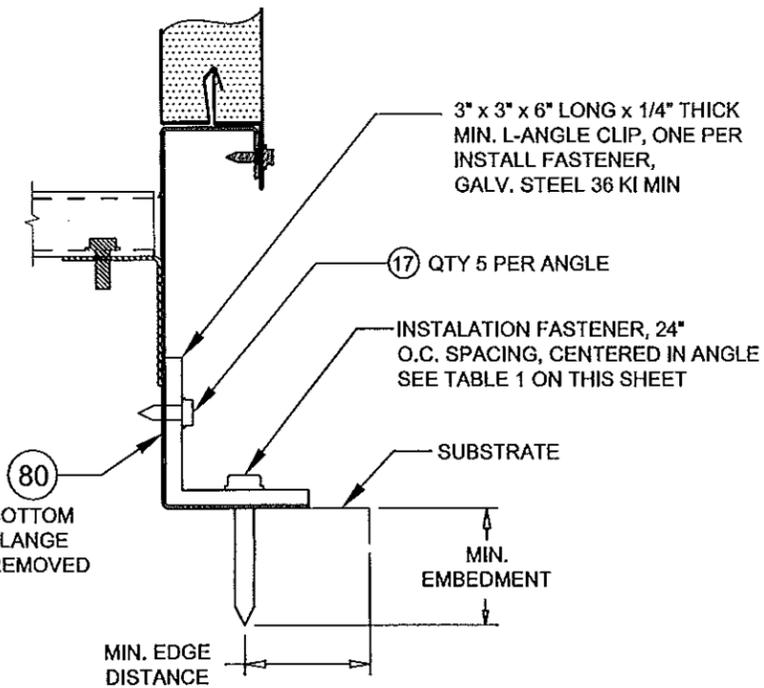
DETAIL C: TYPICAL ANCHORAGE AT ANGLE CLIPS
